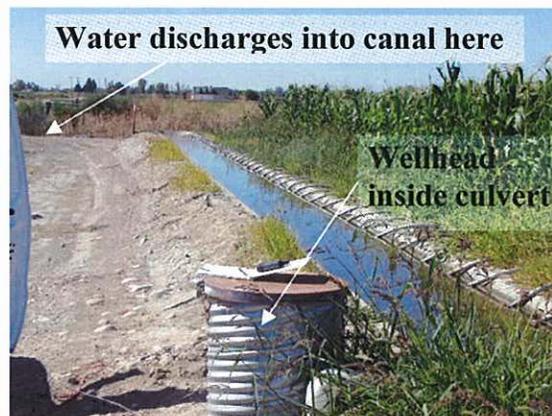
Facing south looking at vertical culvert containing the wellhead.
